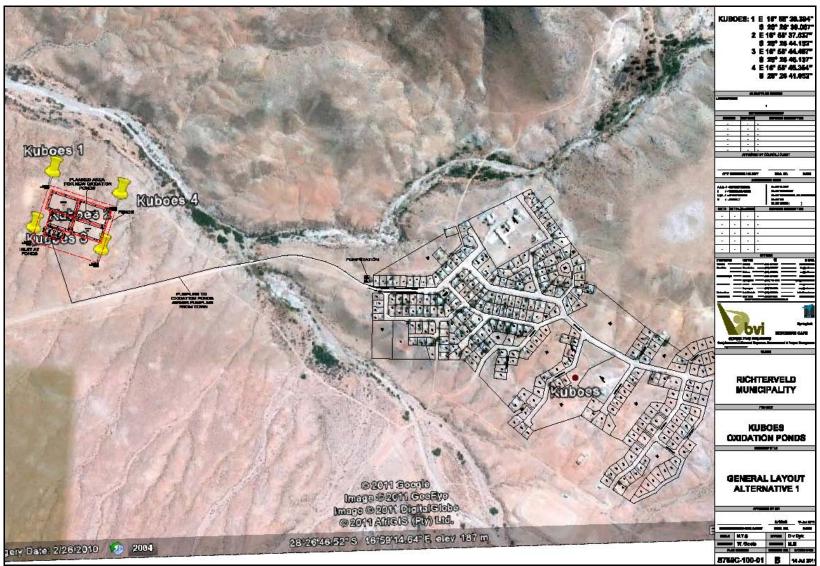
Proposed layout of the Kuboes Oxidation Ponds
